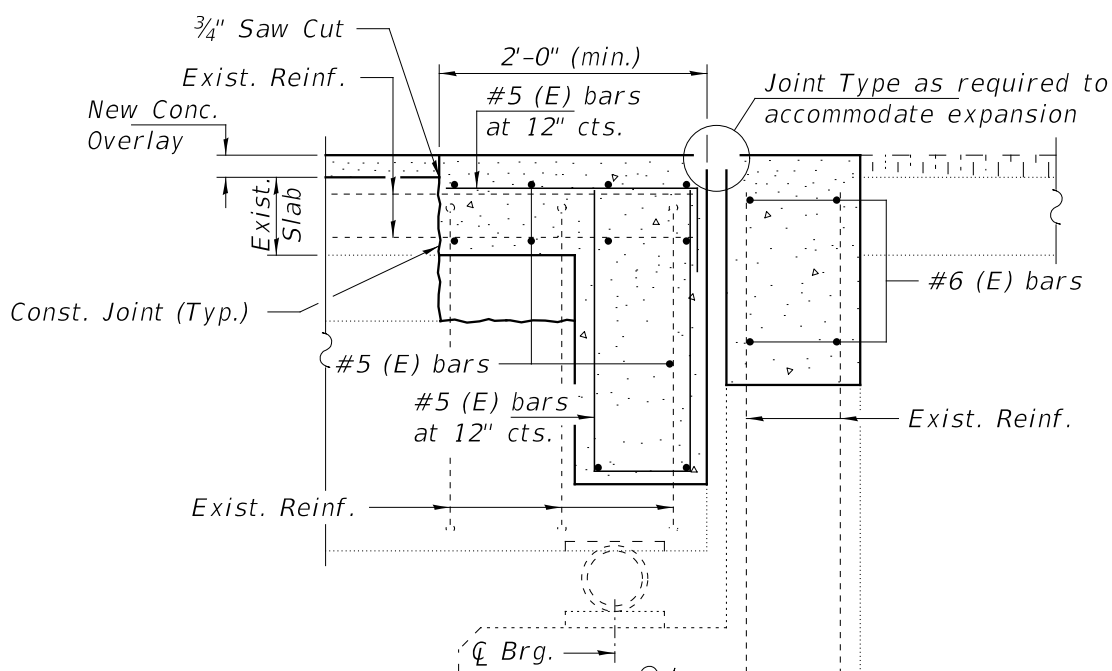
R.C. Deck Girder Joint Reconstruction (Full Removal)
